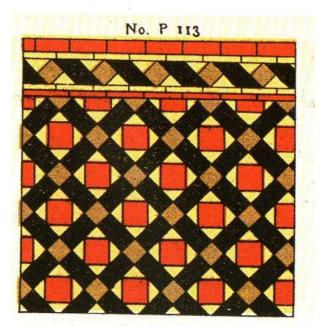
Possible reconstruction of the conservatory floor (Long 2002)
